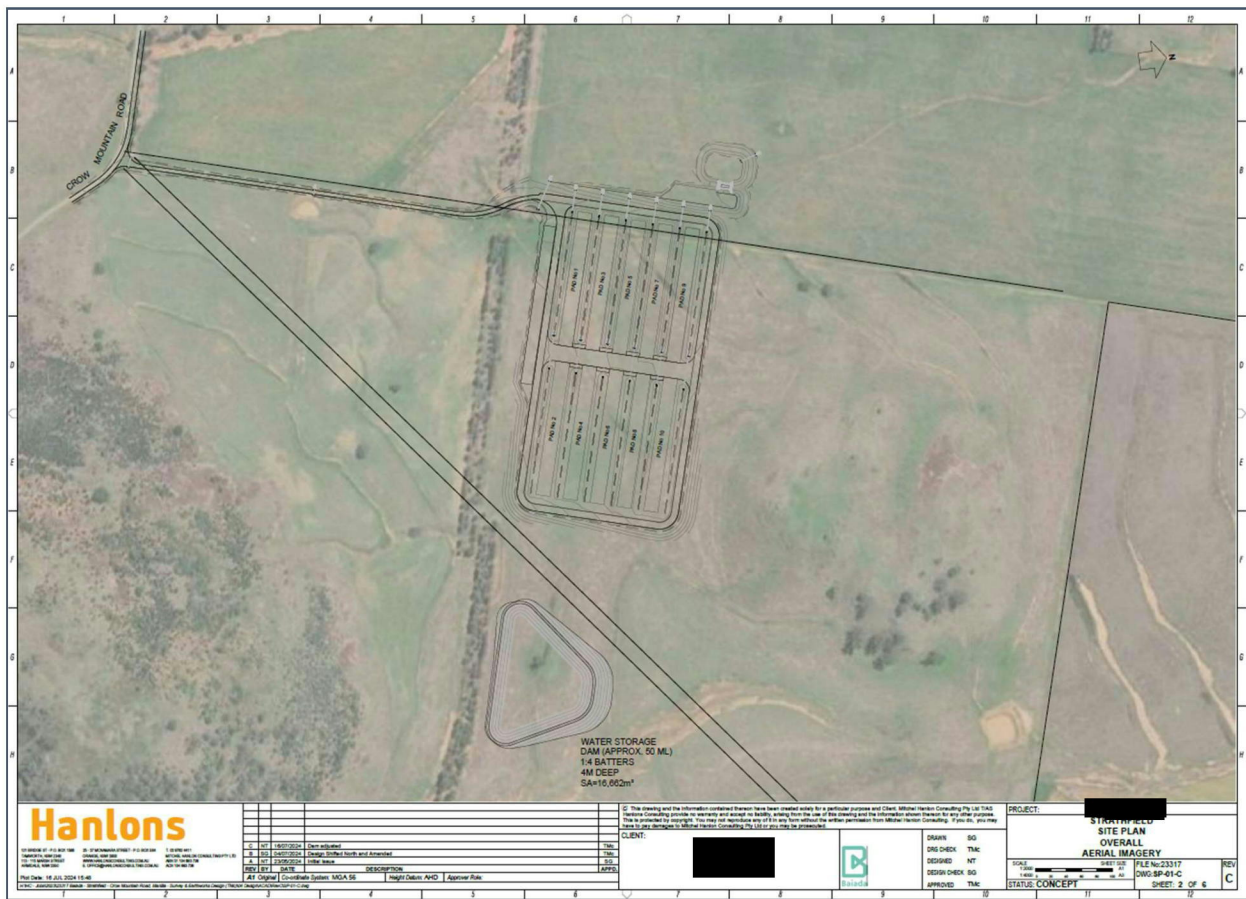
Modified Farm 4 Layout Plan (Hanlons, 2024)
